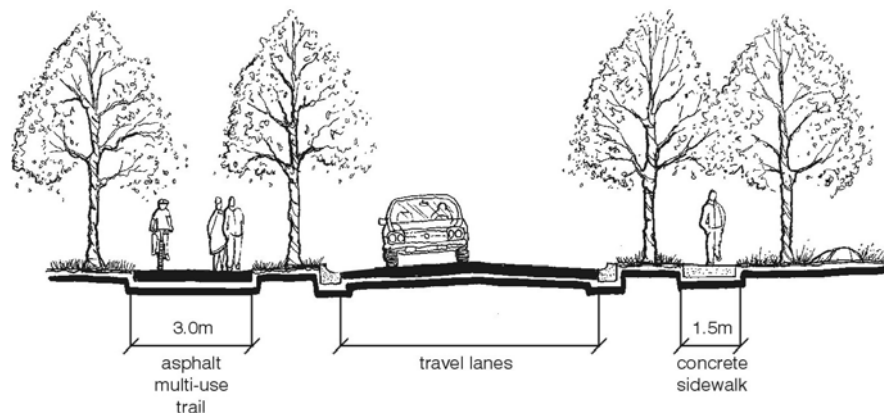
Schematic of a Roadway with a Two-Way Bikeway Boulevard
